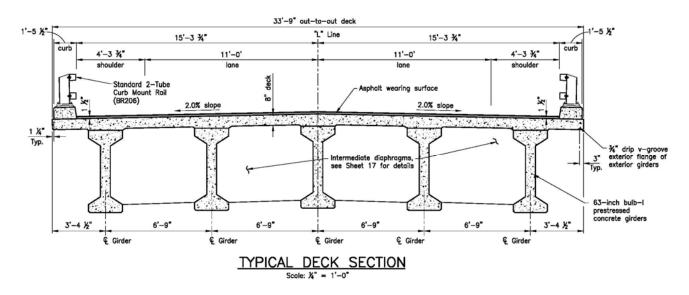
Cross-section of bulb-I with concrete deck slab alternate
